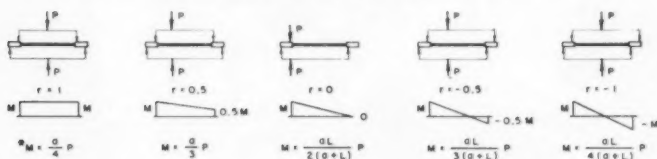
ARRANGEMENT FOR TESTING PAIR OF I-BEAM SPECIMENS
